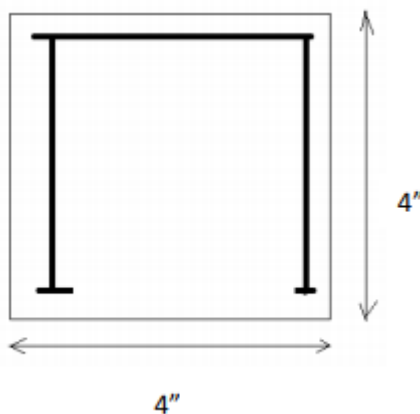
Open cross-section square beam. Maximum dimensions of Cross-section 4"x4"
